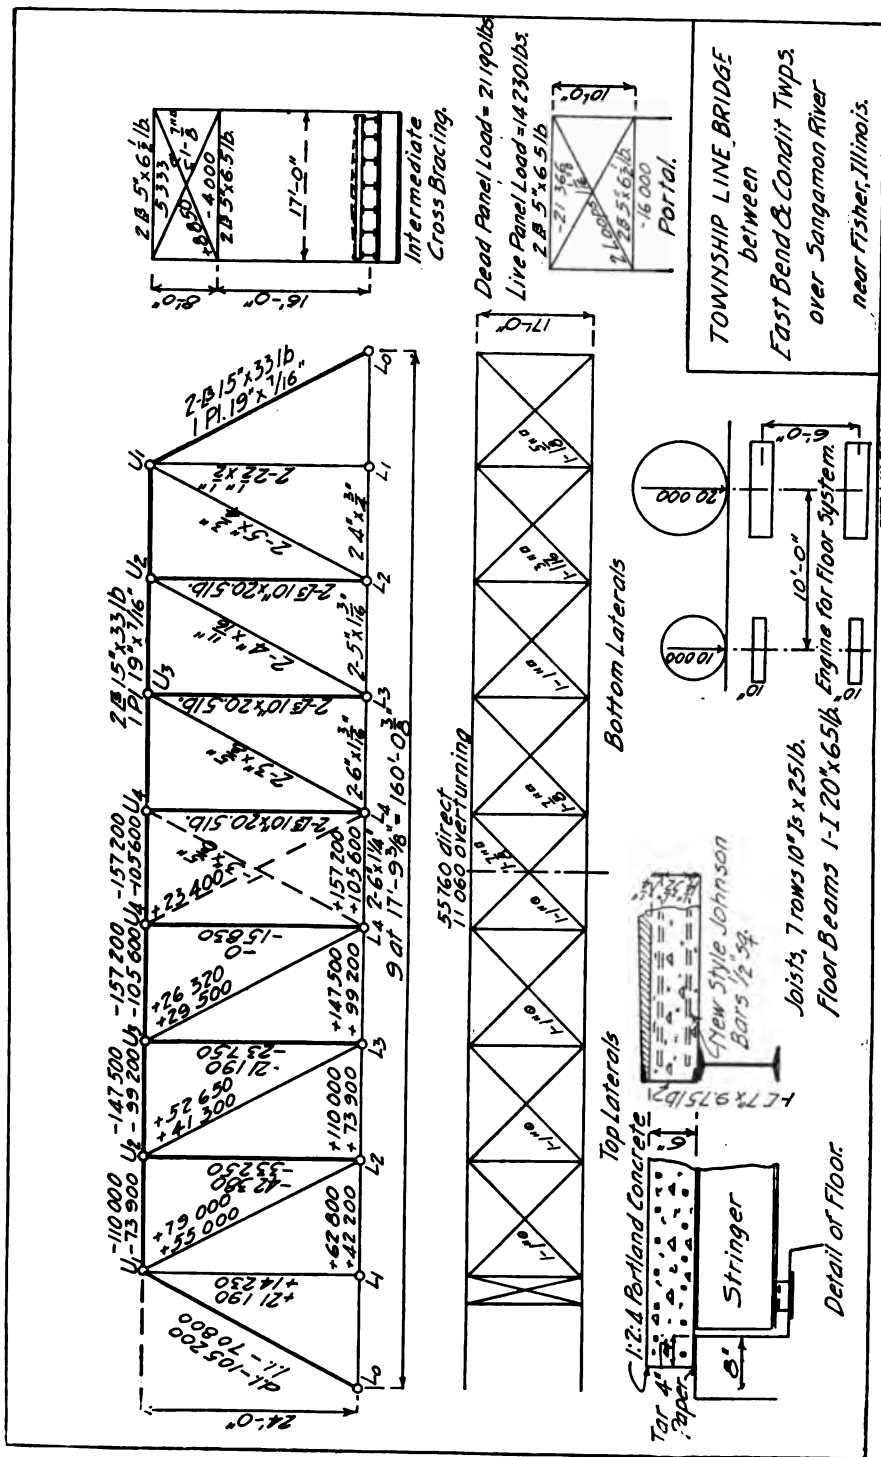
Stress Sheet of Through Pratt Truss Highway Bridge.
